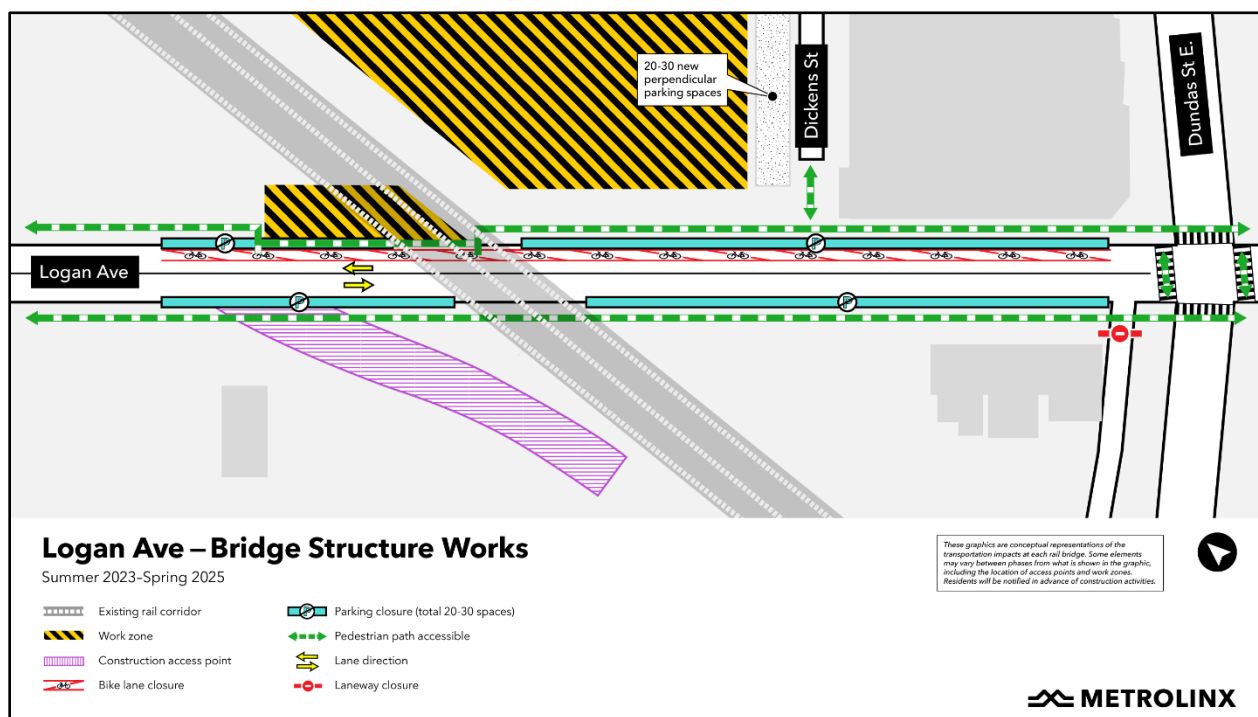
Logan Avenue Traffic Management during Bridge Abutment Works Source: Metrolinx
